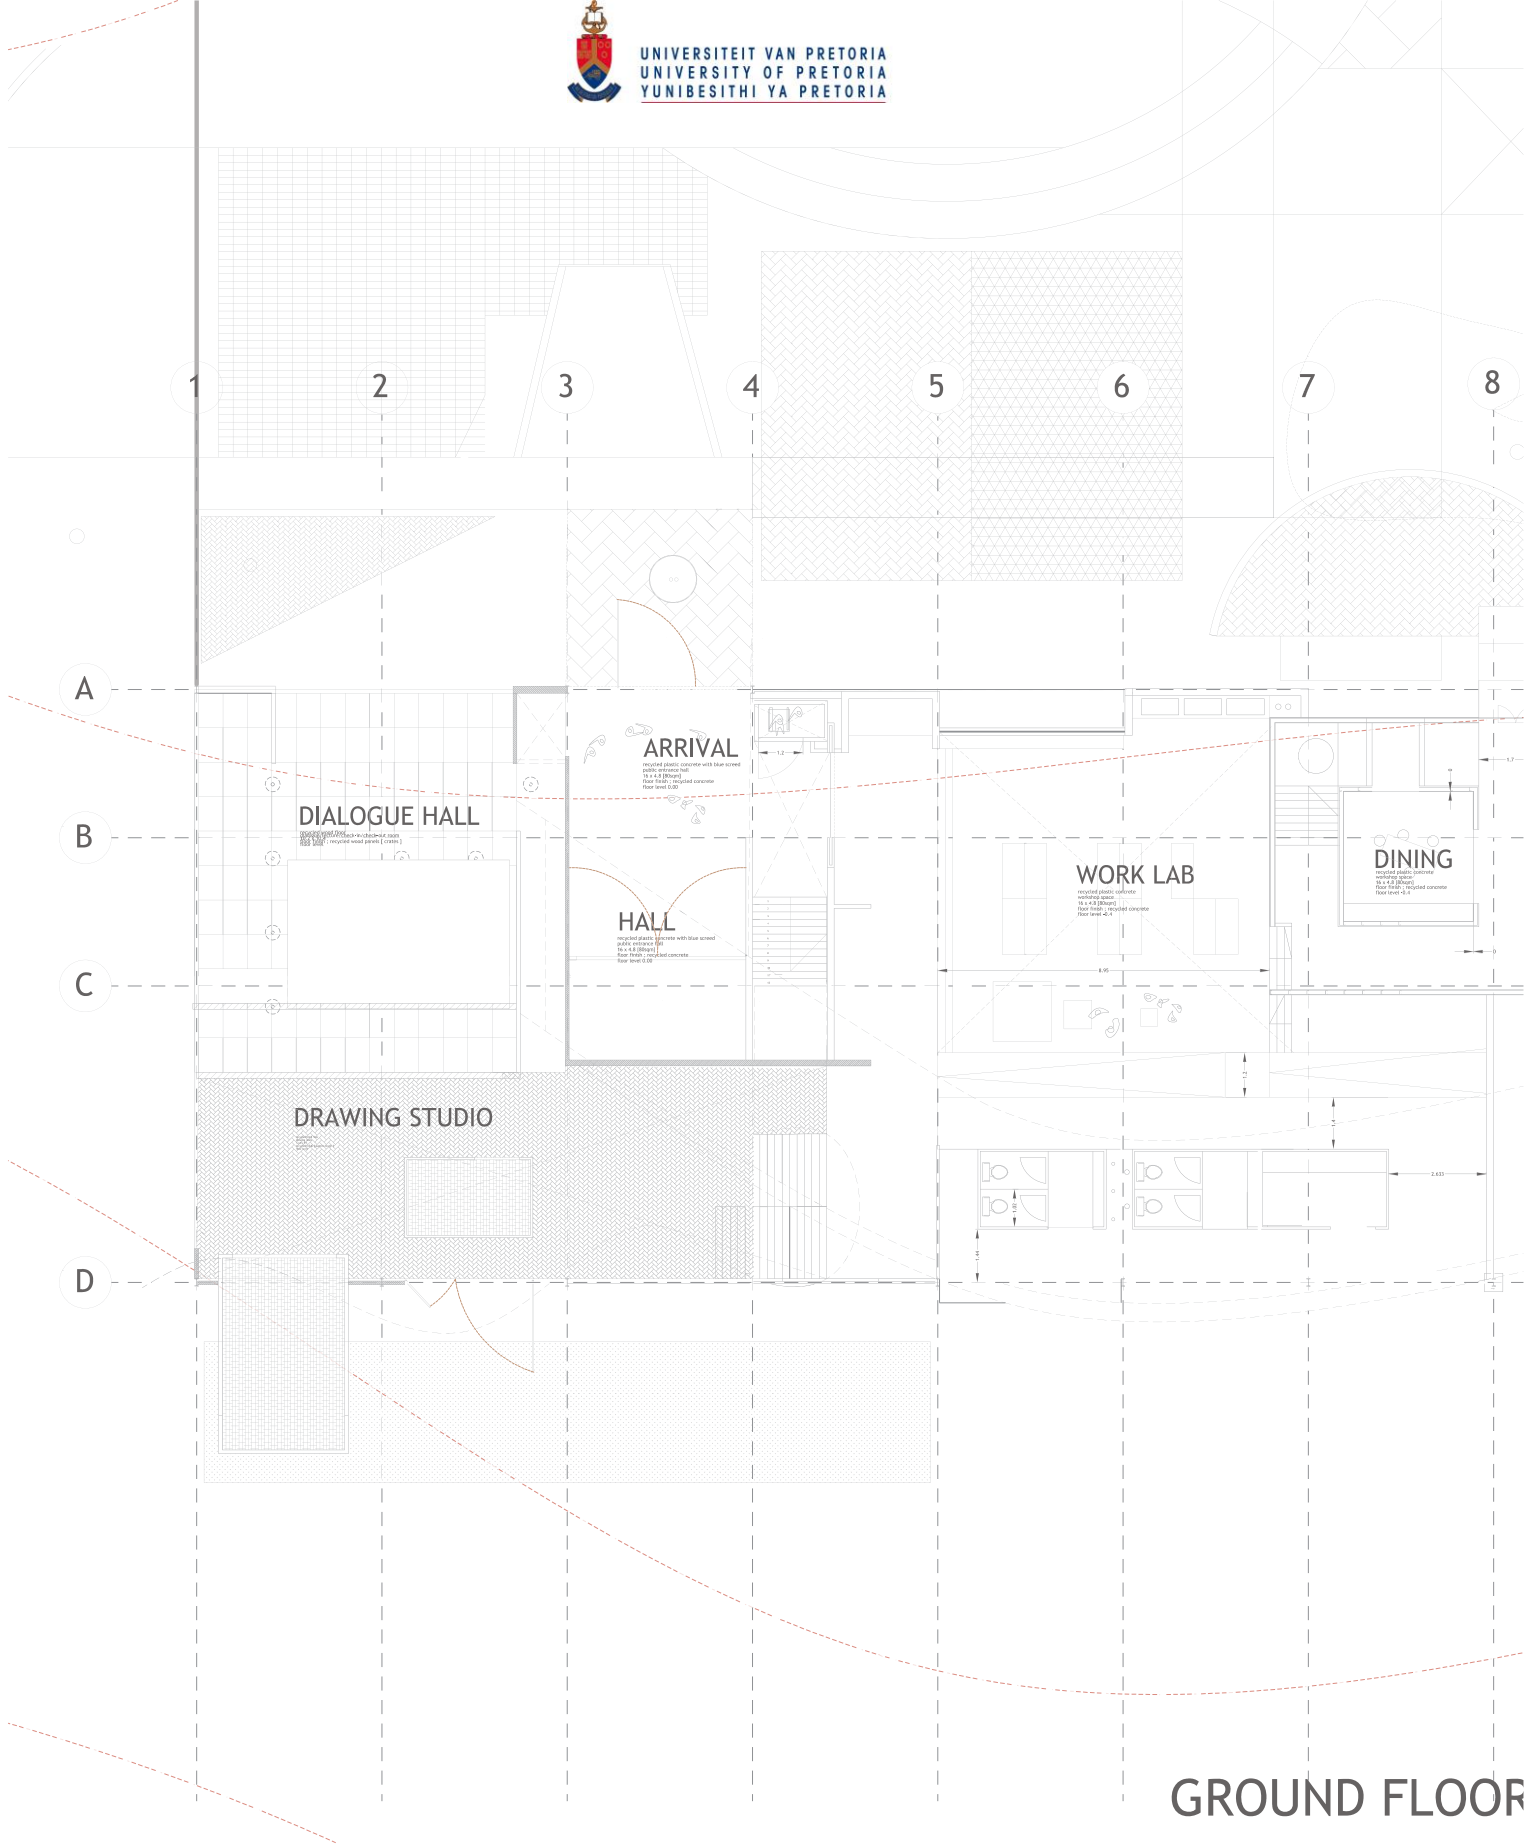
Ground floor sketch plan overlaid with gallery curve overhead.
